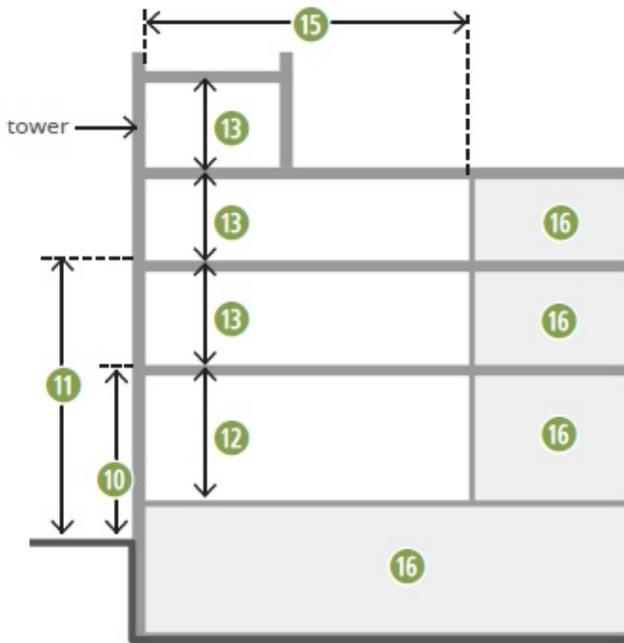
C. Civic Building: Heights & Uses Requirements
